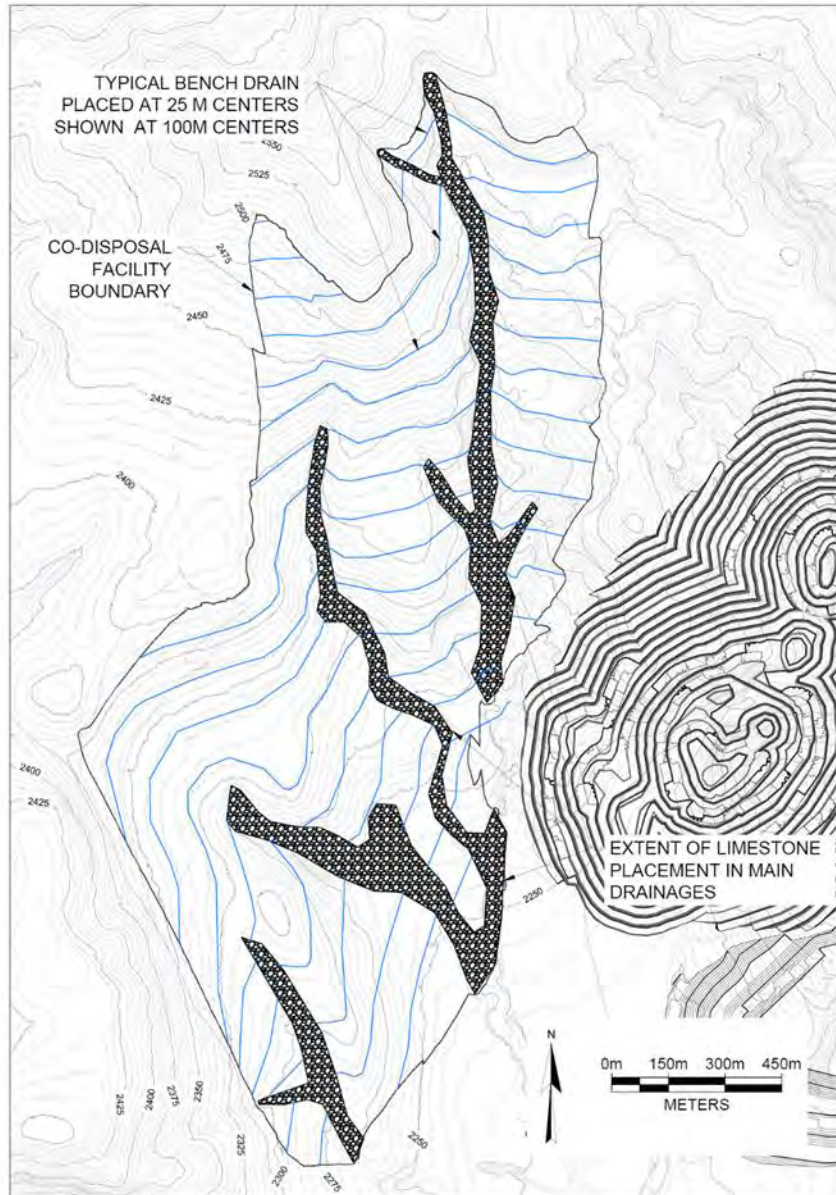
Typical Underdrain Configuration Author SRK, 24 January 2019.
